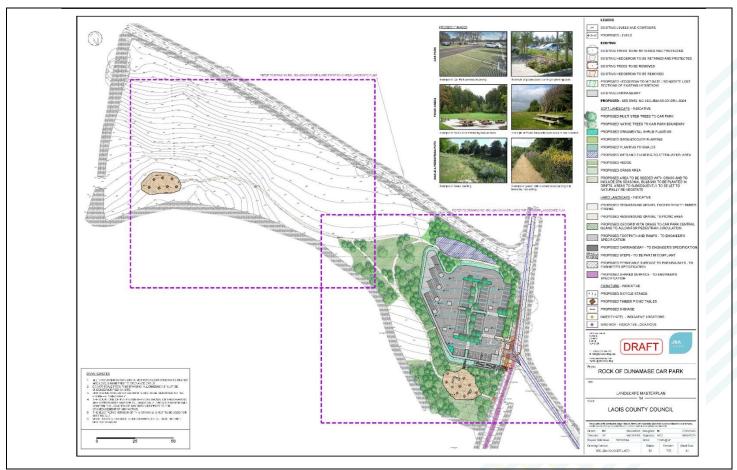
Proposed Landscape Masterplan (Refer to Drawing no. ISG-JBAI-XX-XX-DR-L-0001)
